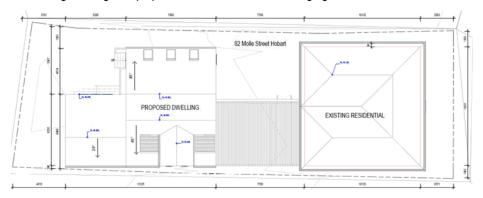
Site Plan showing existing dwelling to be retained and proposed extension at the rear of the site (Beehive Design, 2021)
